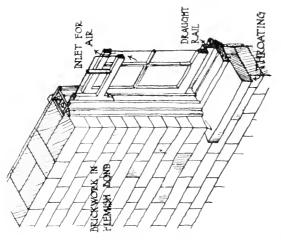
As this window has a draught rail fixed to the sill, the lower sash can be slightly raised without exposing the room; in this way firesh air is admitted between the neceting rails, as shown by arrows in the sketch above. Sash windows are described on page 76.
